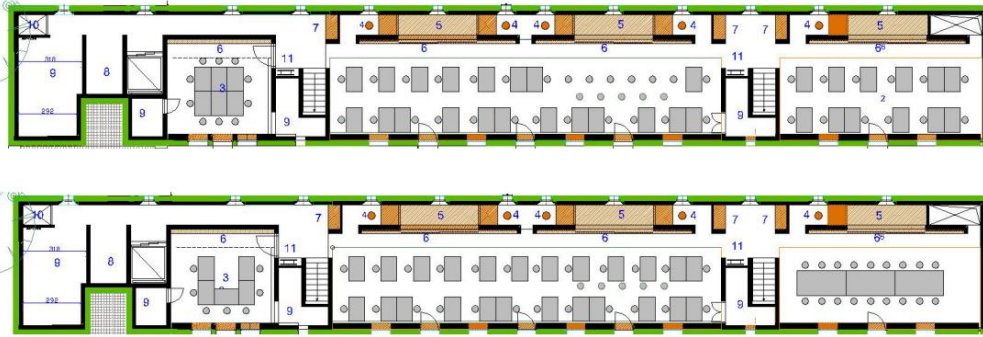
Ground floor and first floor. Source: F. Andrieux et Y. Lepère
